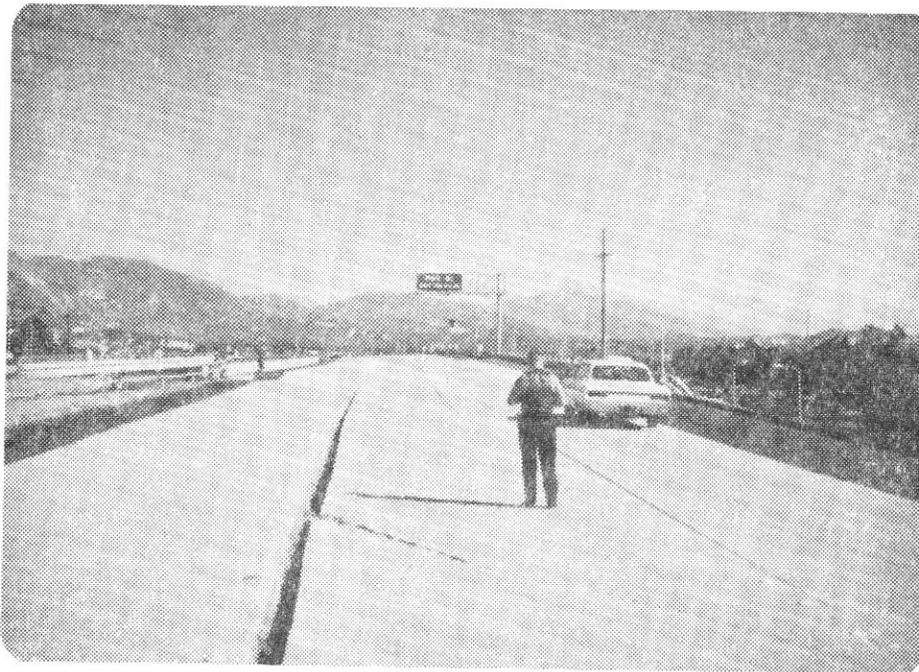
Looking east at Roxford Street Undercrossing. Note pavement separation at longitudinal joint and diagonal crack caused by fill slippage and differential settlement.
